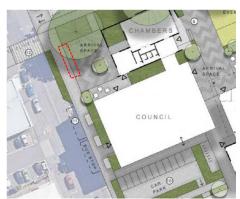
Landscape plan with current bus stops indicated and proposed relocation area in red. bike
